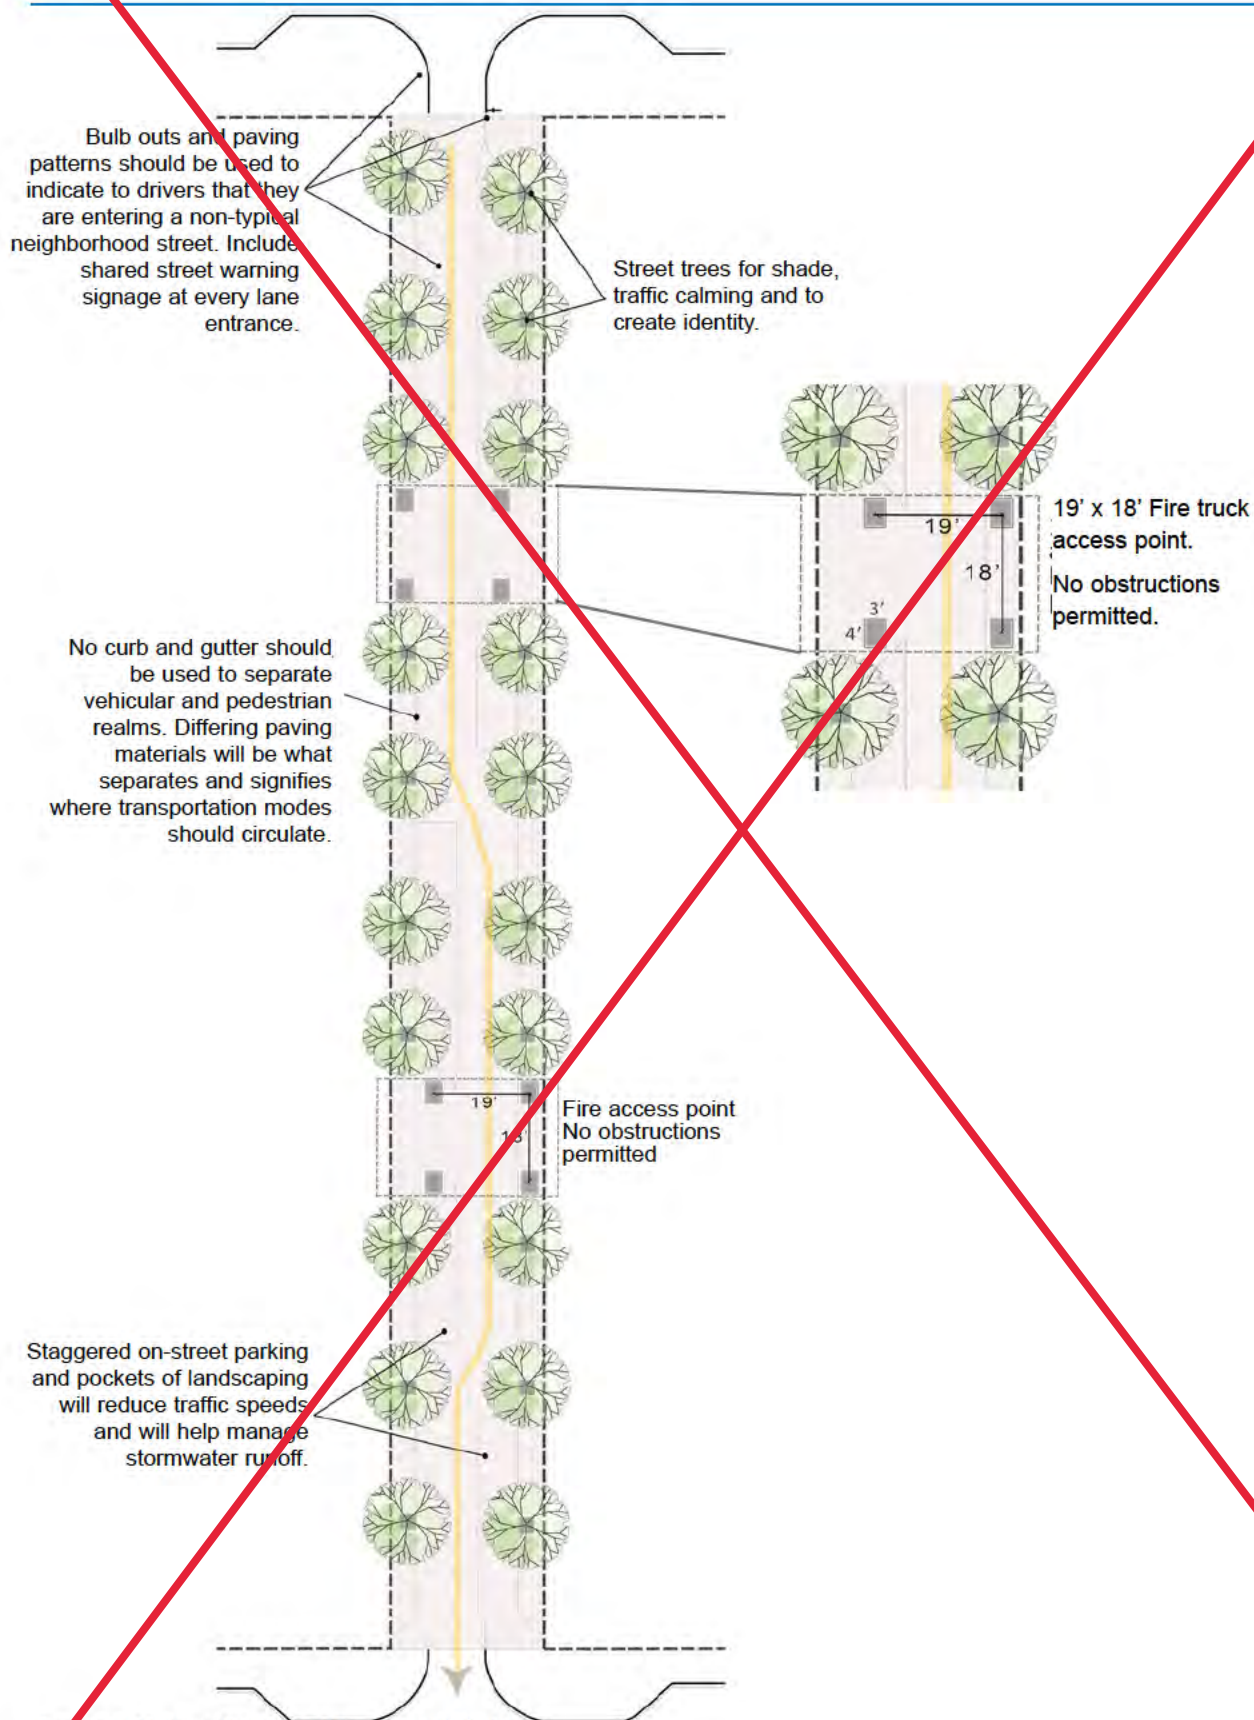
(3). Lane Plan View & Fire Access Bulb-Out
